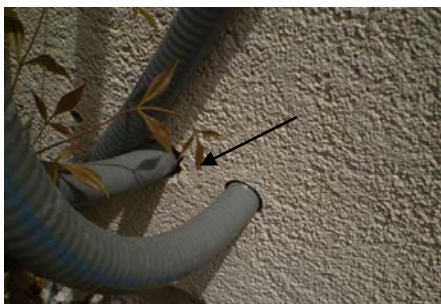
UNSEALED PENETRATIONS AT CONDUITS SOUTH
